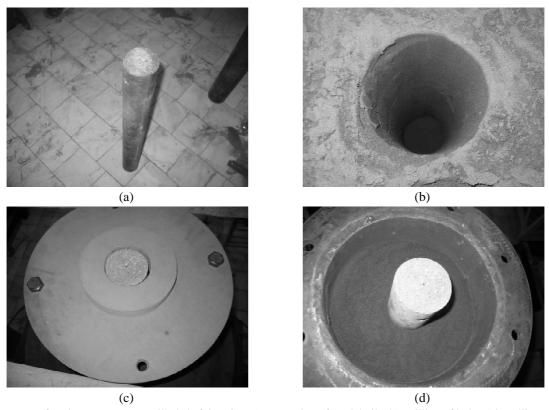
Sequence of testing on concrete Drilled shaft in FCV: a) pre-casting of model pile, b) Drilling of hole, c) installing of model pile, d) applying bottom pressure of FCV
